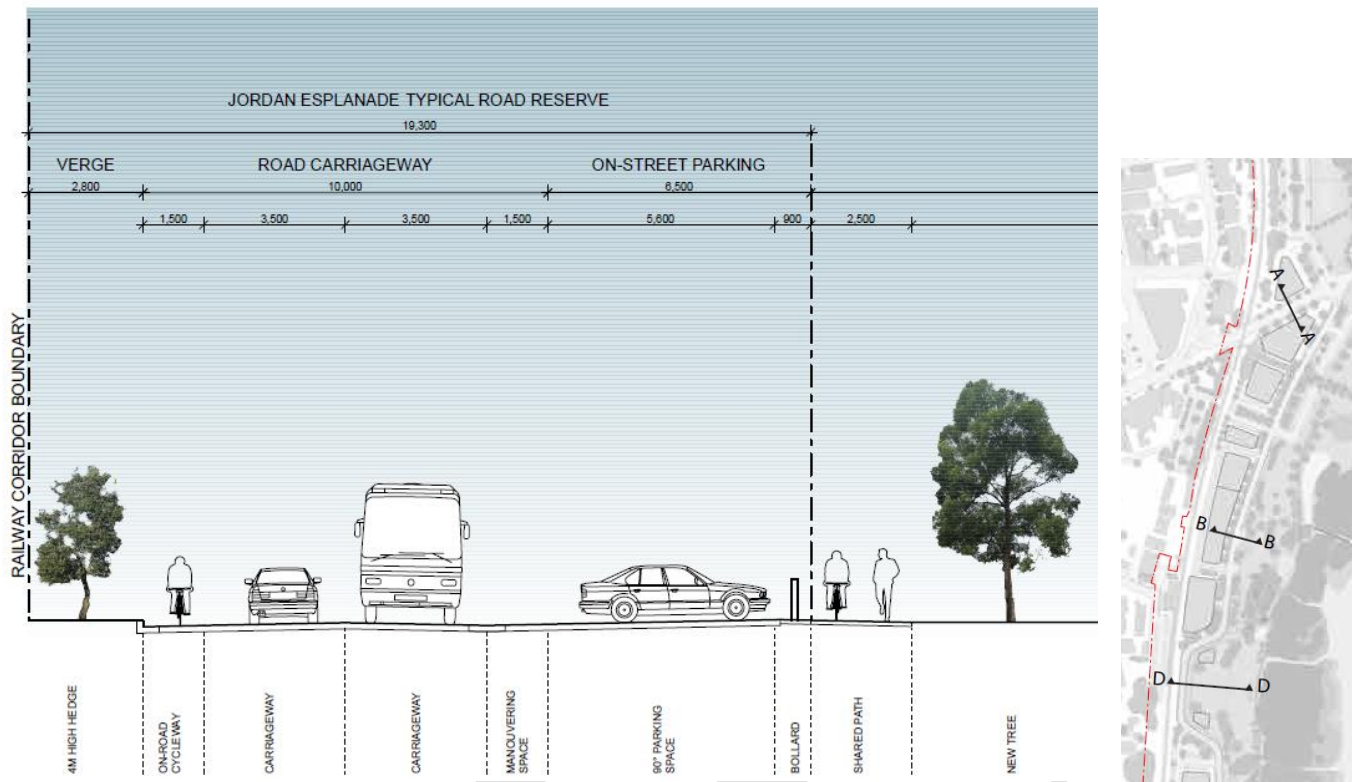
Typical street cross section adjoining new open space (Jordan Esplanade) (Section D)
